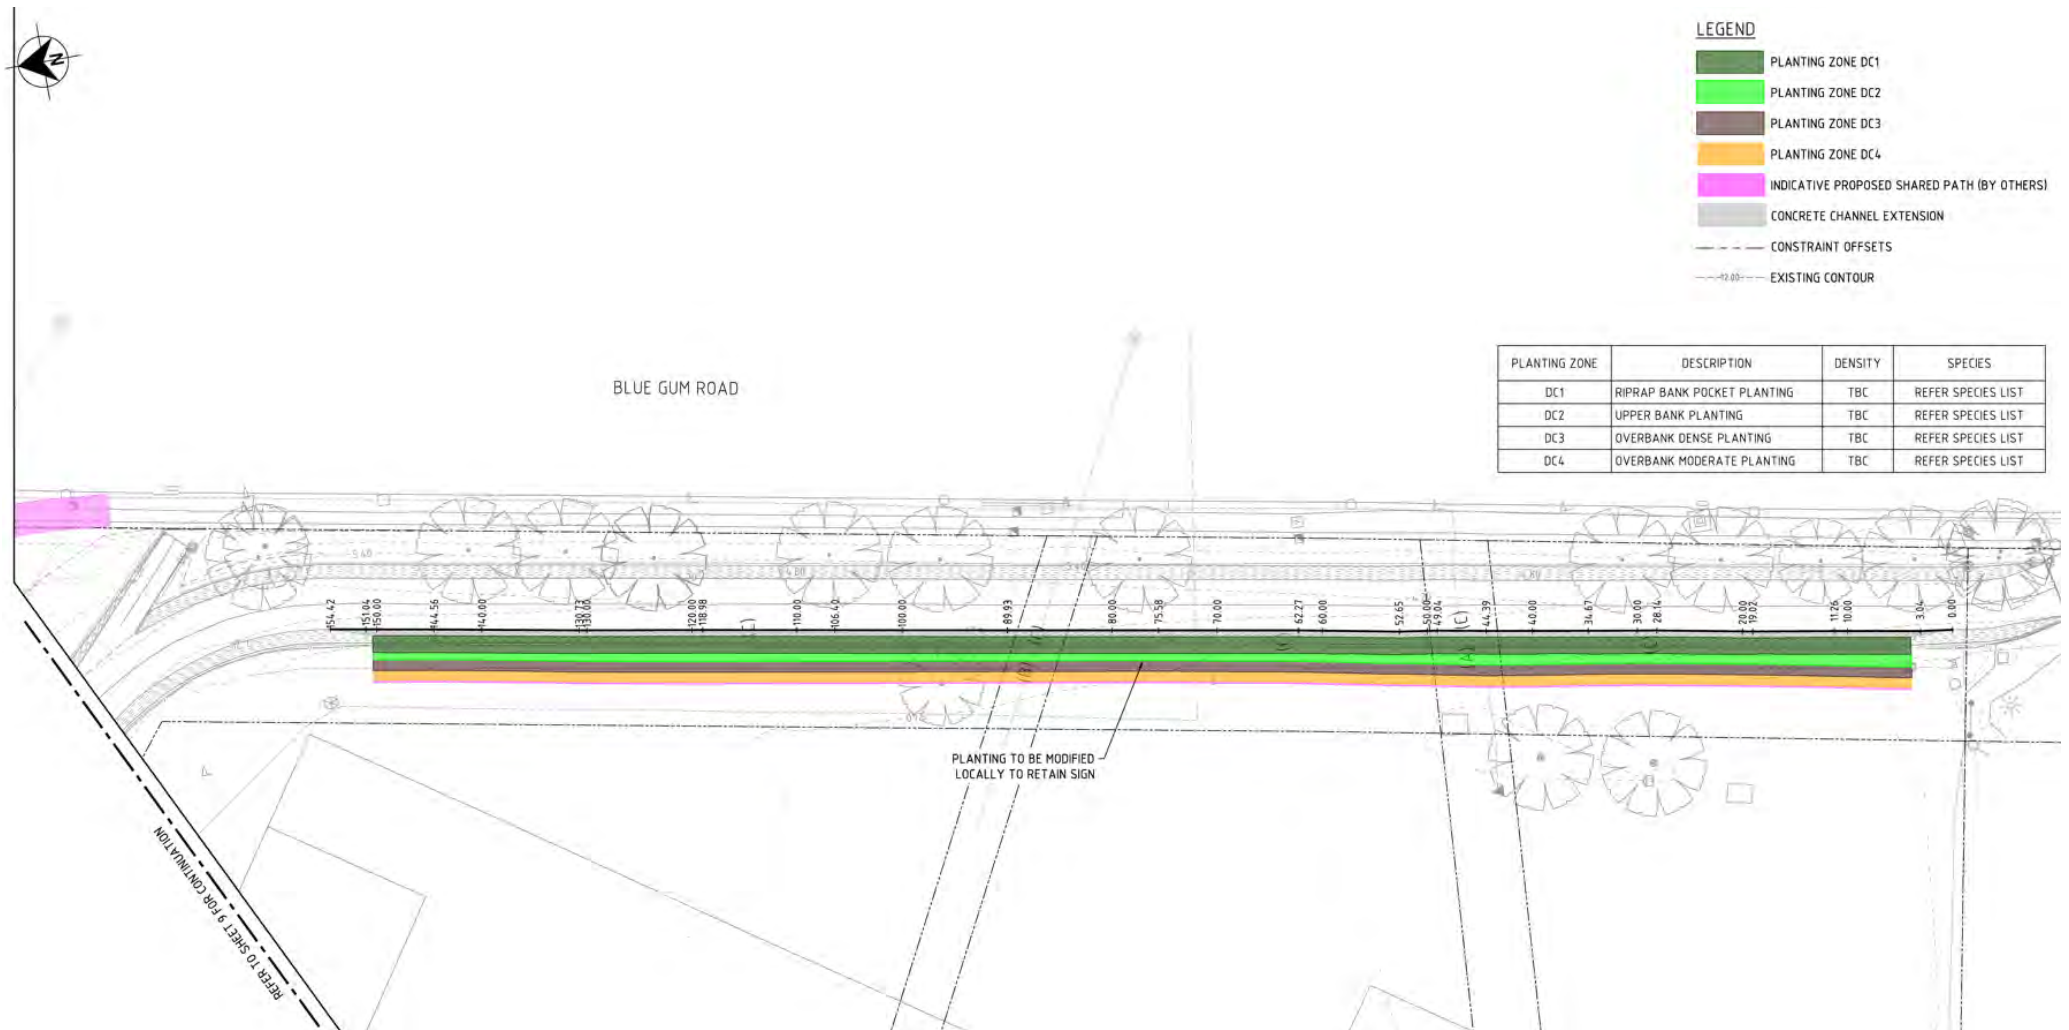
Dark Creek Heaton Park, Jesmond (Upstream) – Plan Overview
